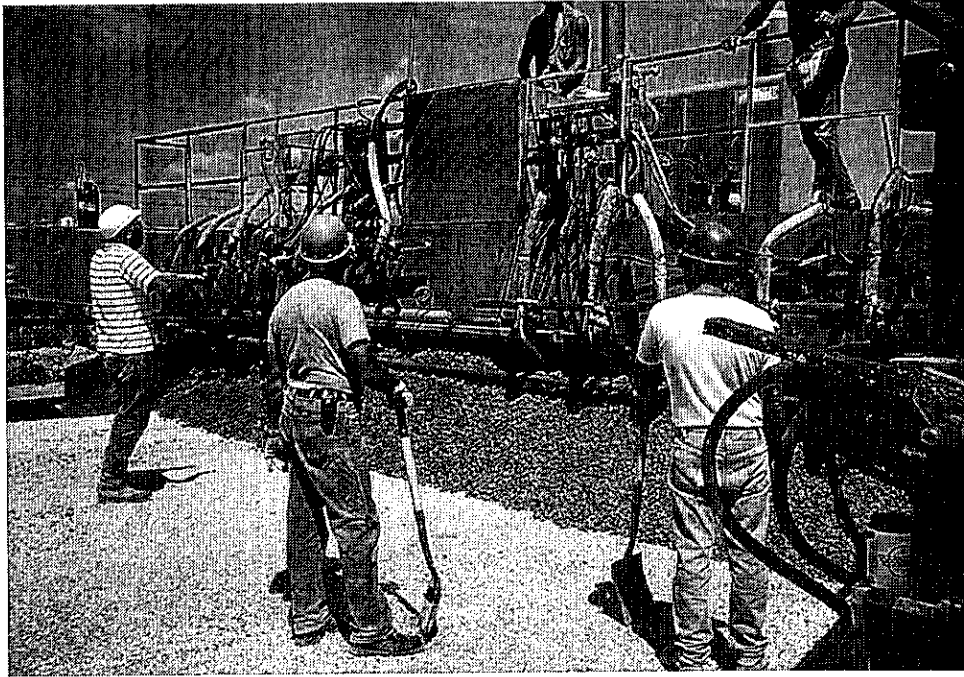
CMI concrete paver used on the LaSalle/Peru test sections.
